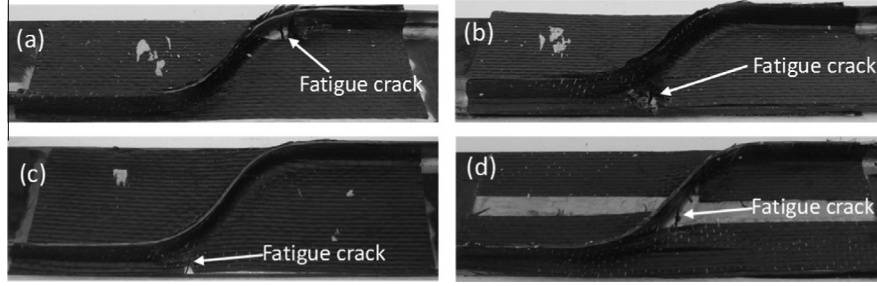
Fatigue cracks at strengthened welded joints: (a) D-S-F, (b) D-T-F, (c) S-S-F, and (d) D-S-T.
